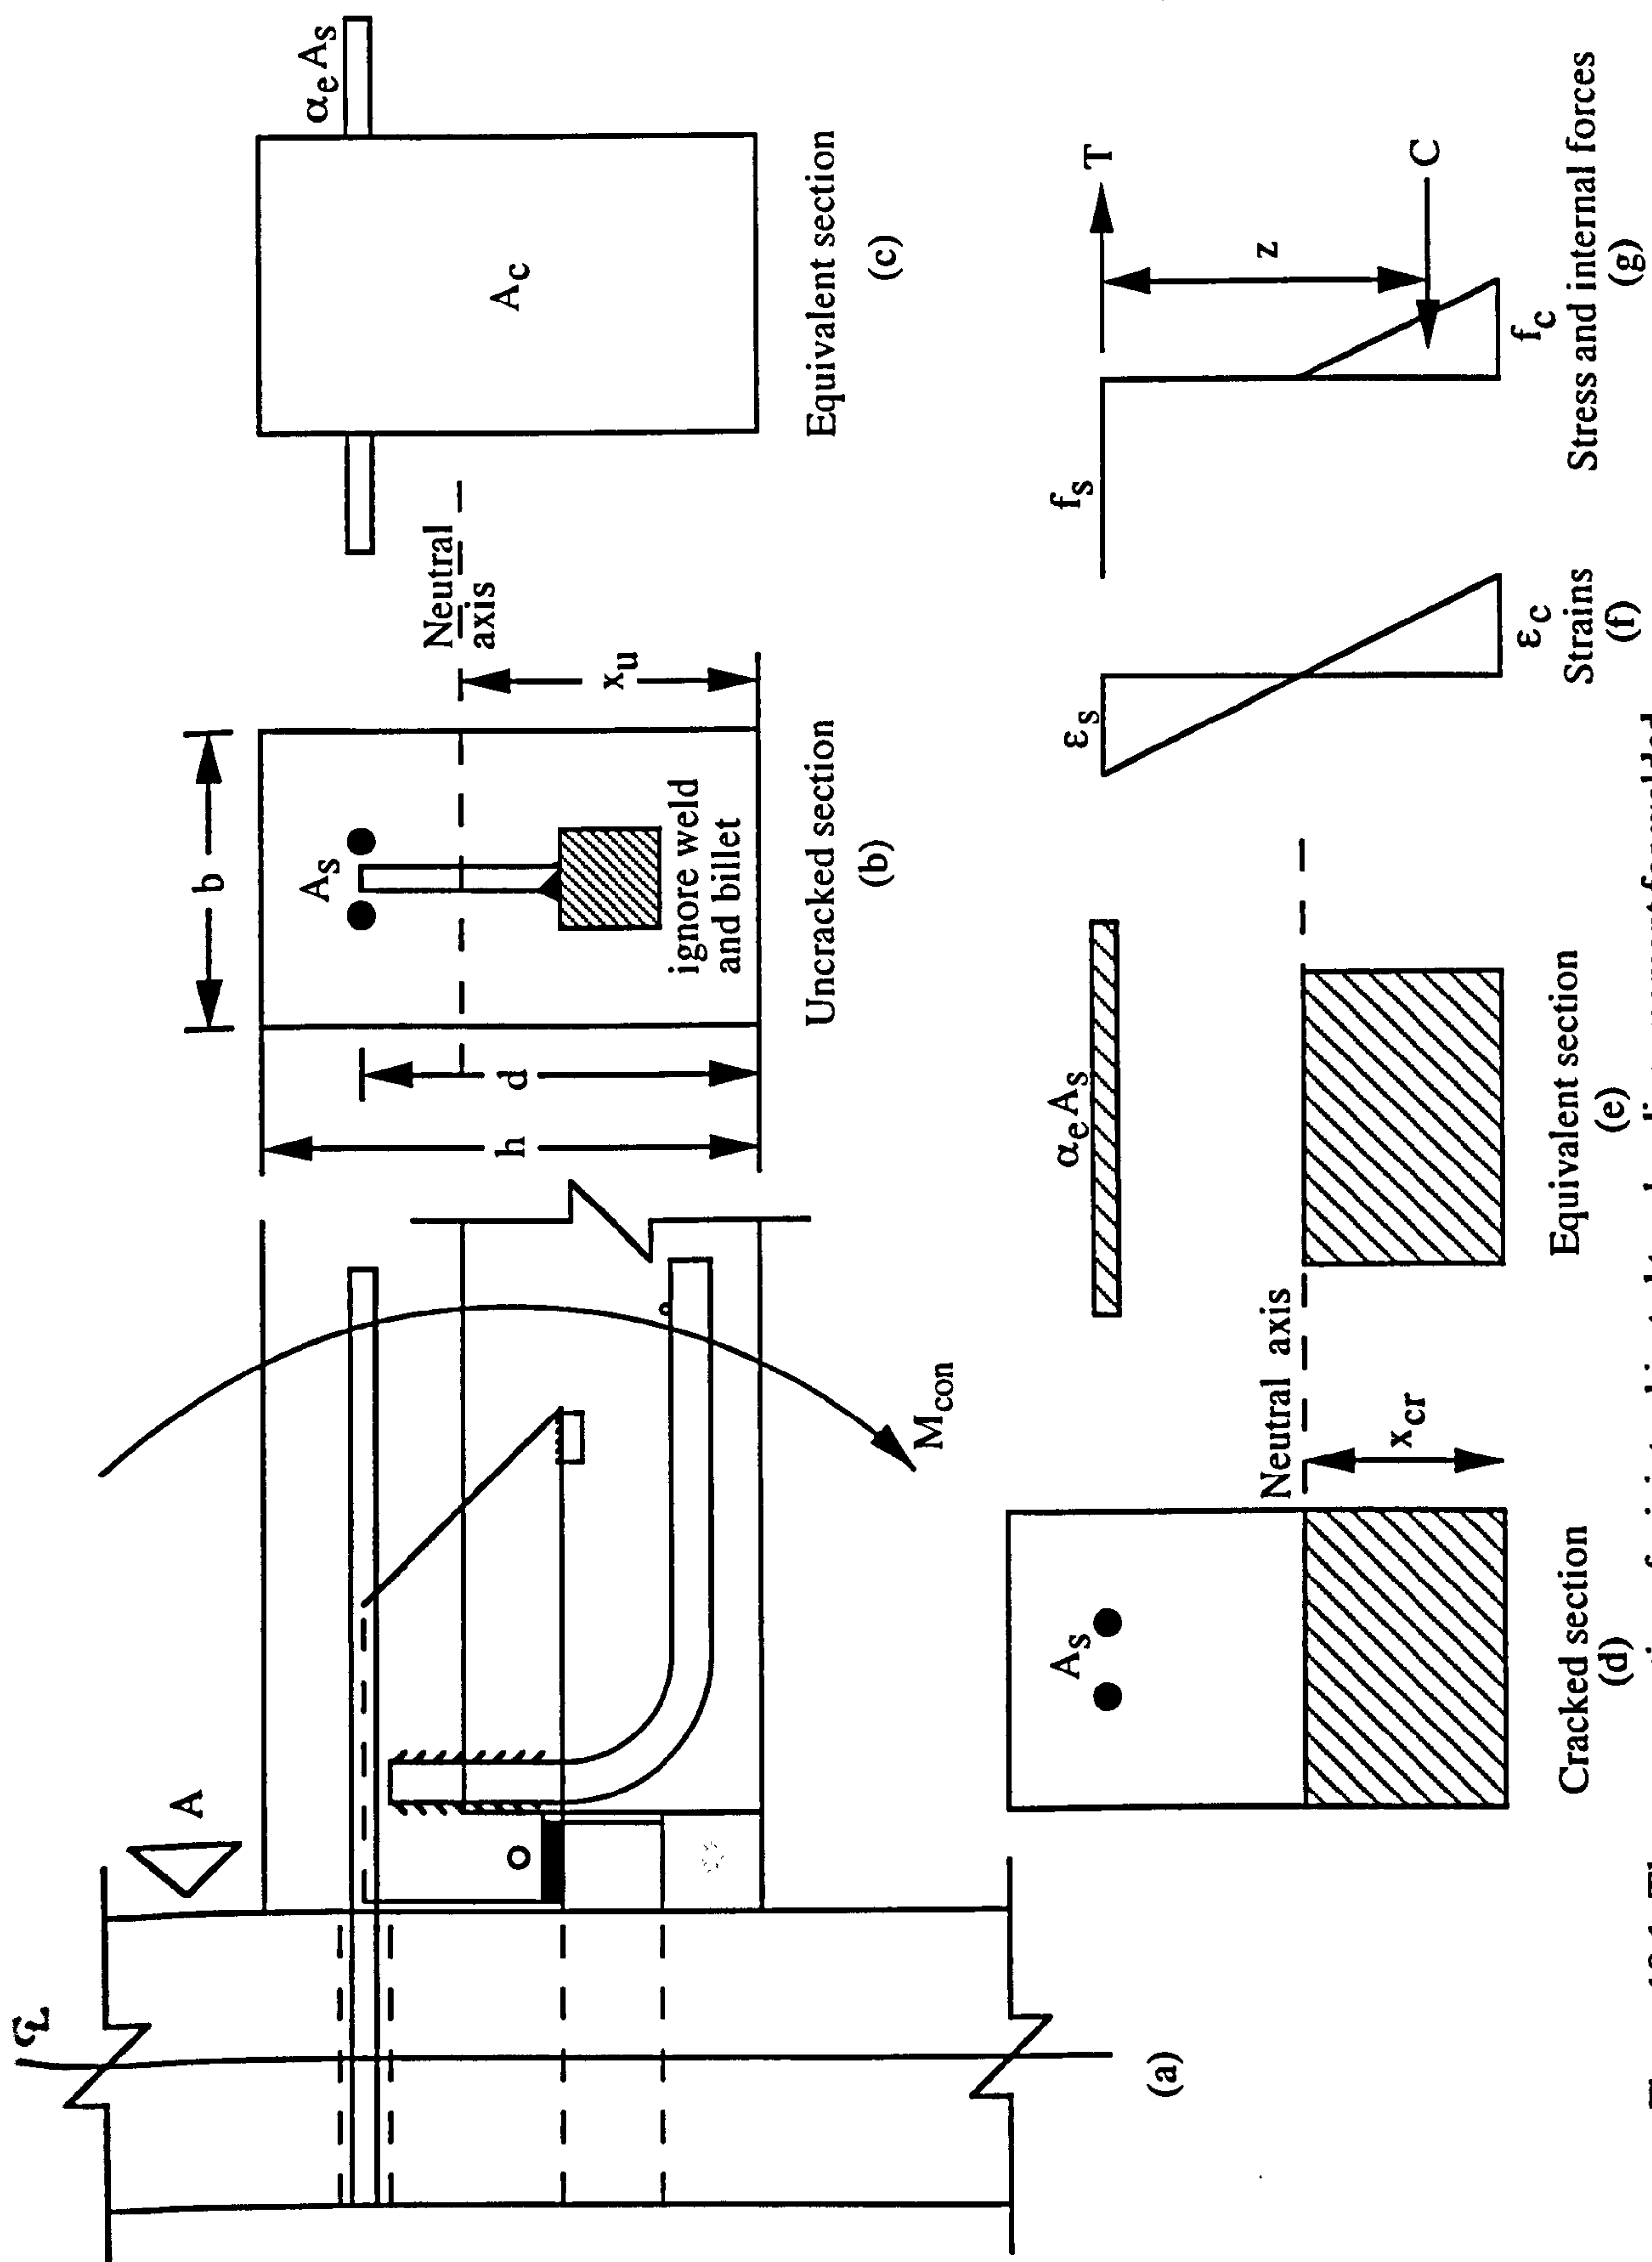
The cross-section of a joint subjected to a bending moment for welded plate and billet beam-to-column connection (two way connection)
